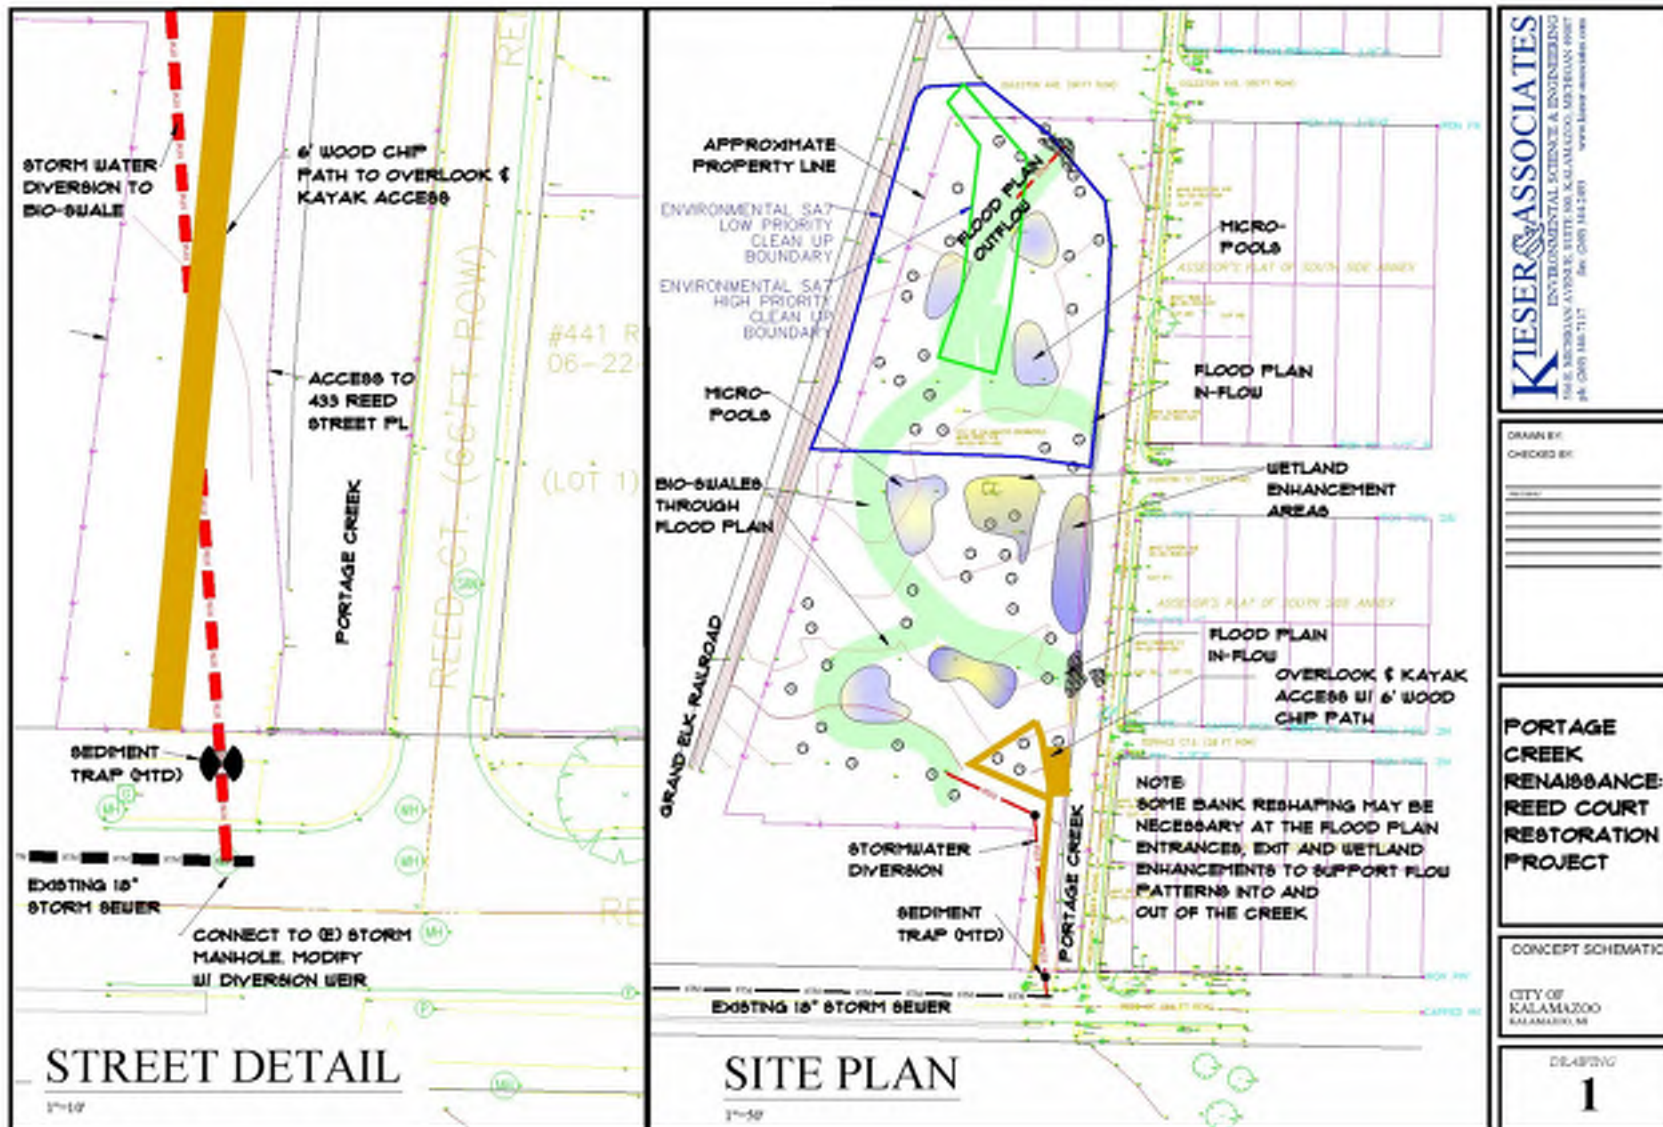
Detailed Site Plan conceptual drawing of Reed Court Floodplain and Stormwater Improvement Project with Street Detail for Stormwater Diversion into project site.
